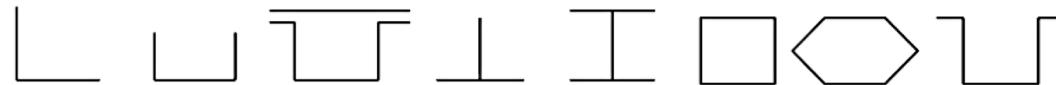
Some typical open and closed cross-sectional shape of prismatic members.
